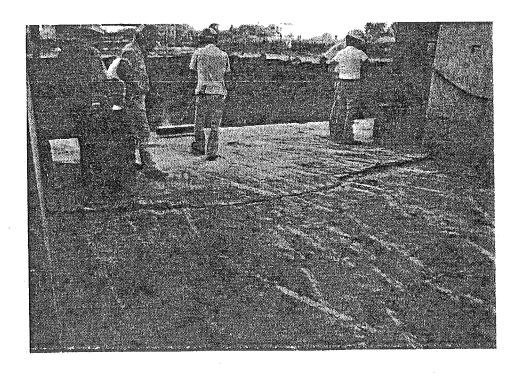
Crack between Pier 11N columns -- looking north toward the river.
